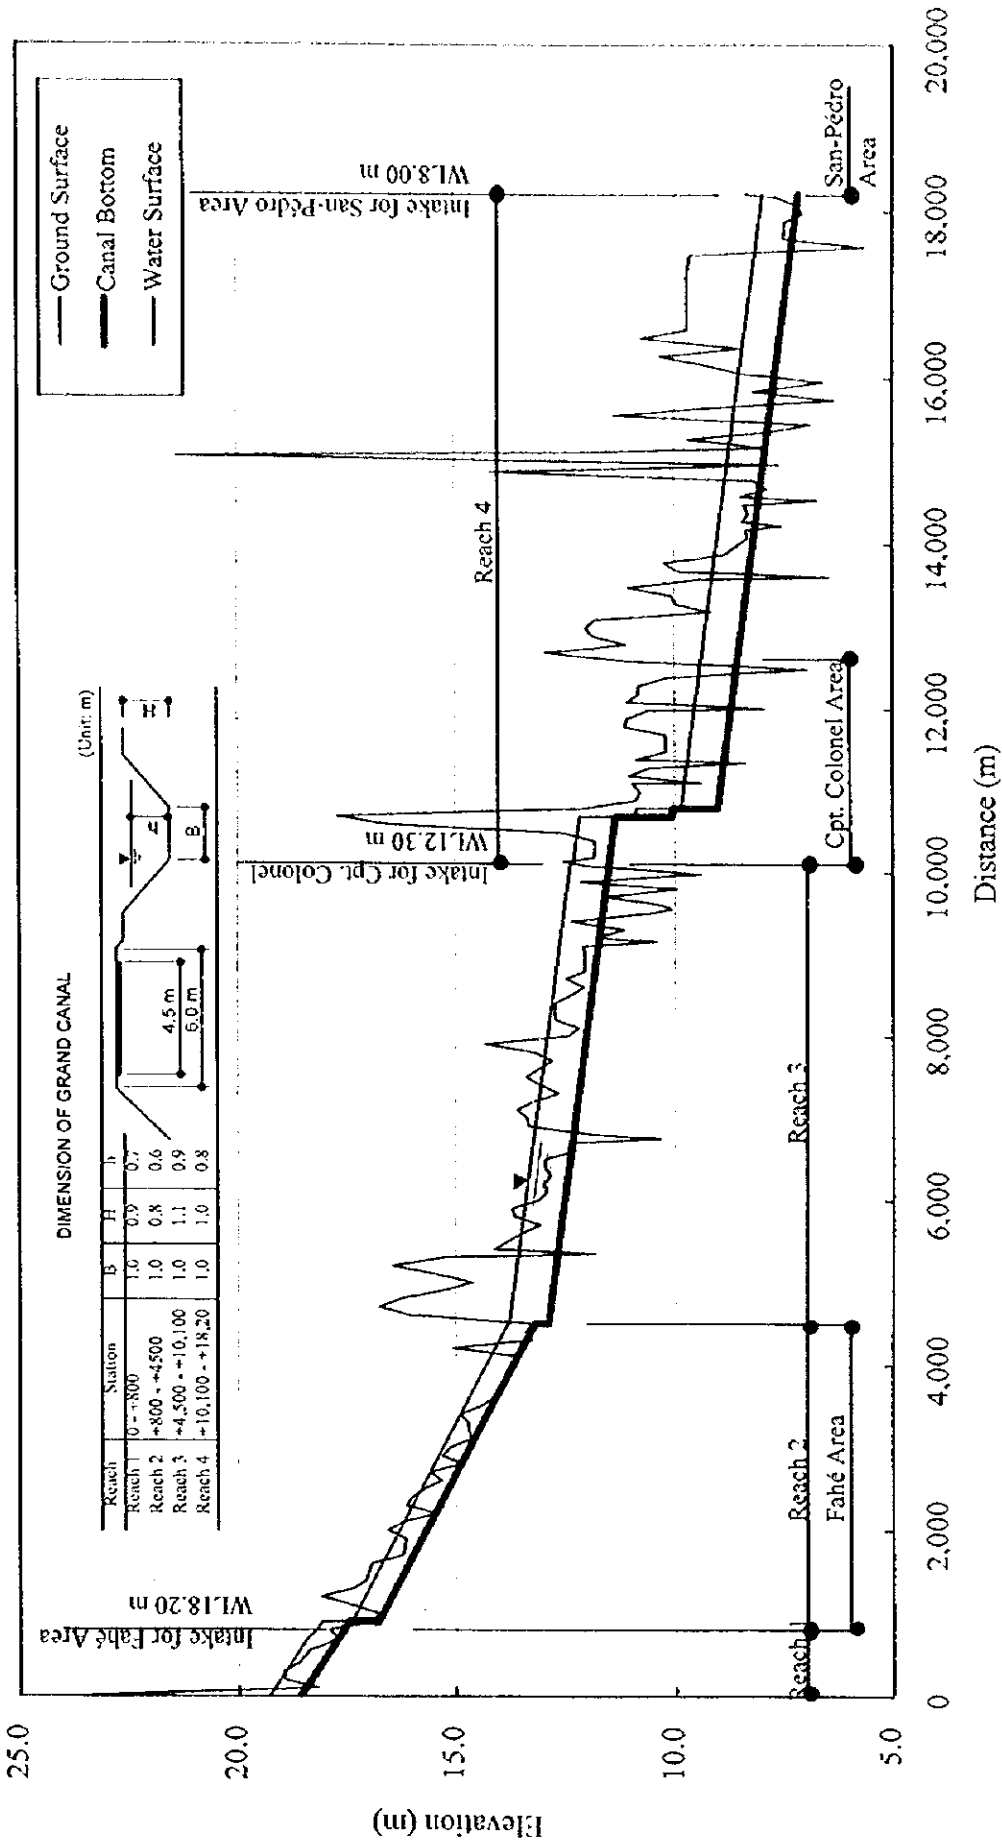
Longitudinal Profile and Cross Section of the Grand Canal
